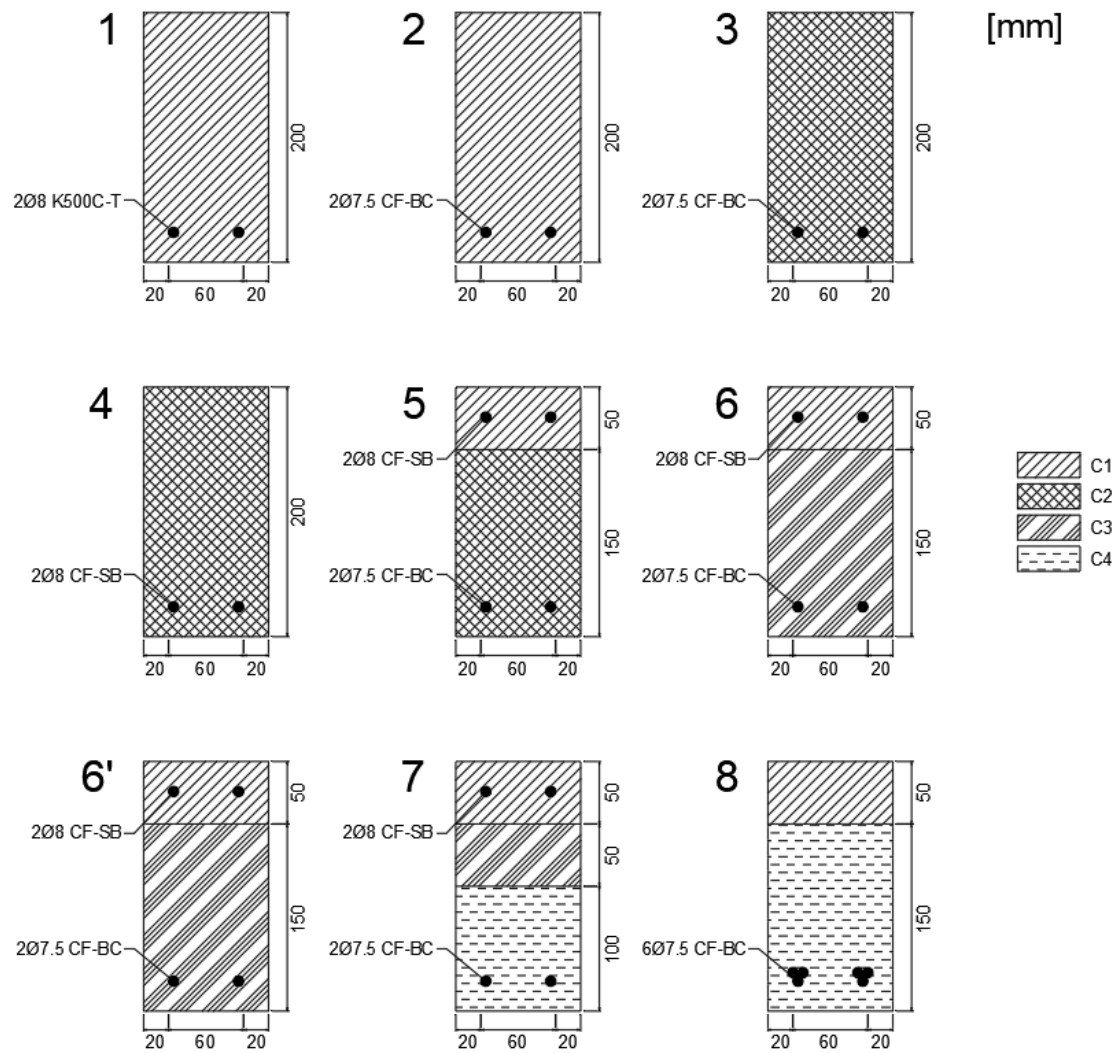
Cross-sections of the different beams, showing type of concrete and reinforcement. Properties of concrete types C1-C4 are given in Table 3.4.
